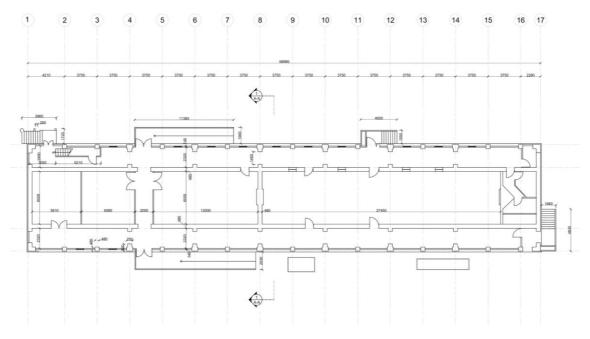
G/F plan, nowadays. (Source: Architectural Services Department)
